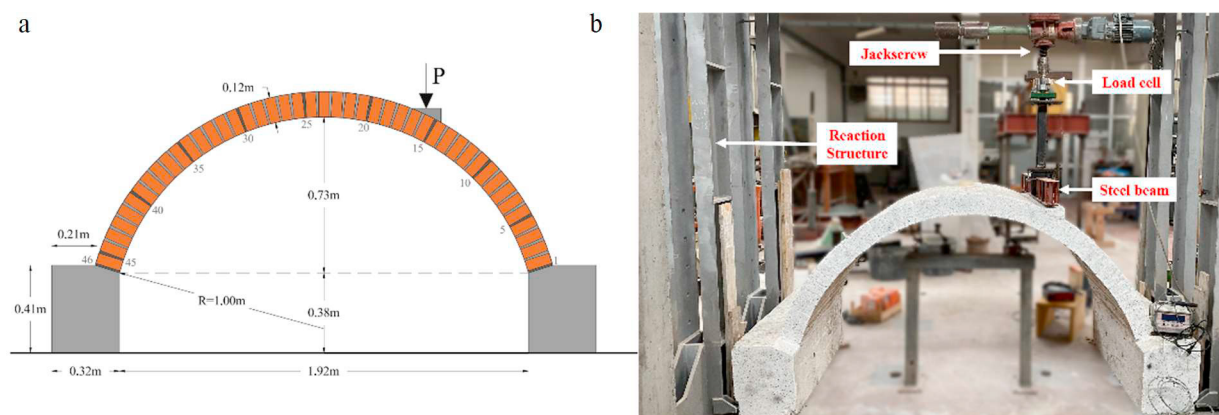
Vault specimen: (a) Geometric details; (b) view of the specimen in the testing apparatus (front side).
